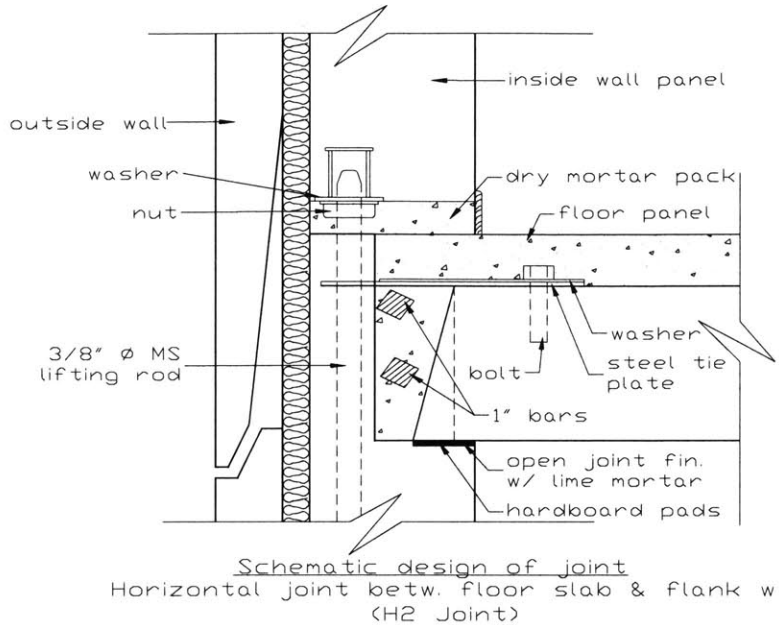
Typical Ronan Point Connection (Rouse & Delatte)
